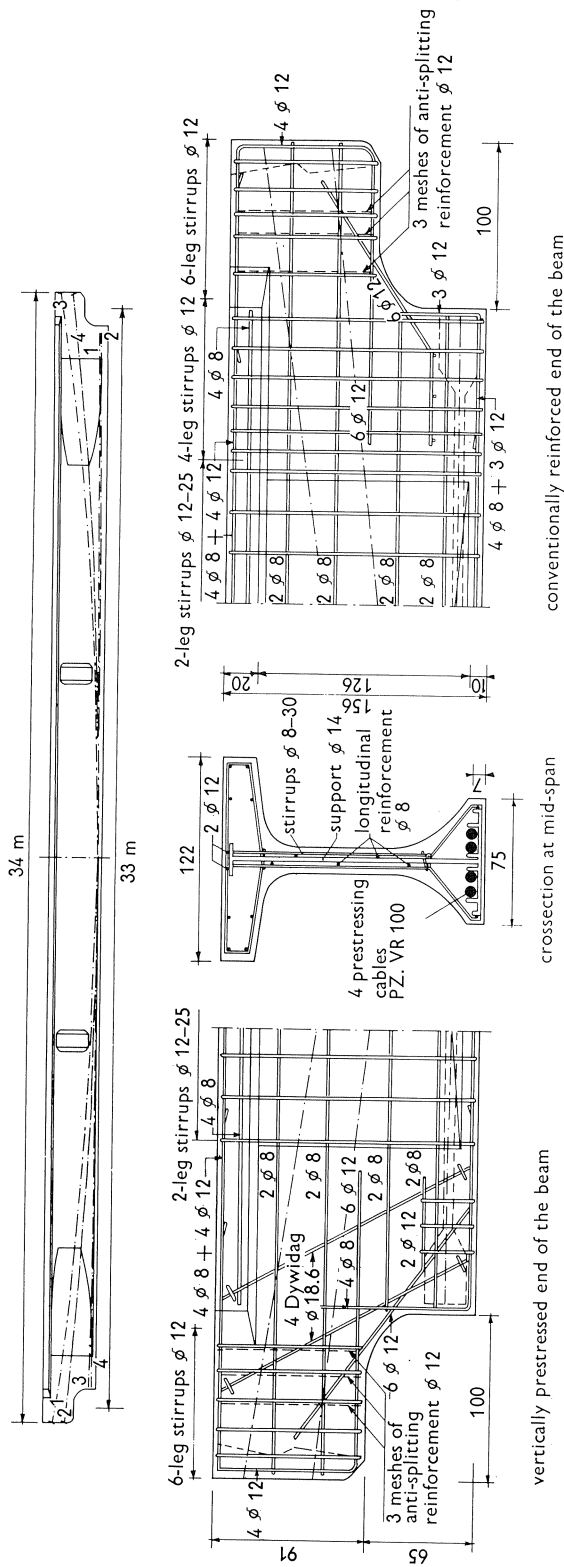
Elevation of the beam, showing prestressing cable profiles and details of both tooth structures.
